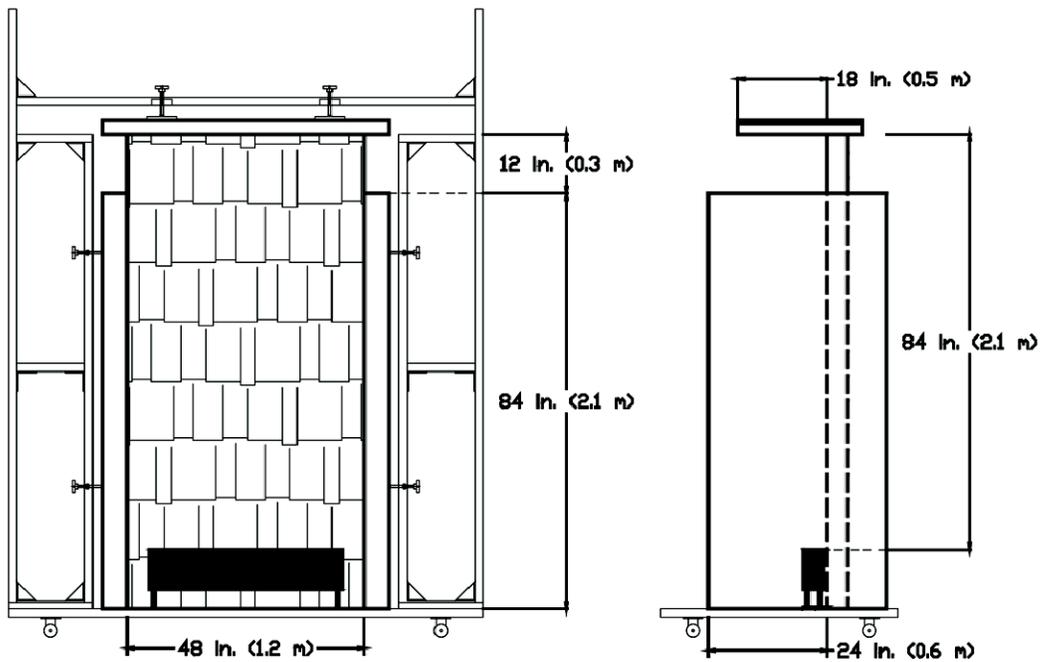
A-1-1. EXTERIOR WALL TEST ASSEMBLY
